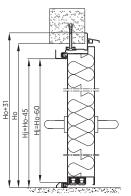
Installation of a single-leaf door to a masonry wall – corner frame with a thermal break – vertical cross-section
